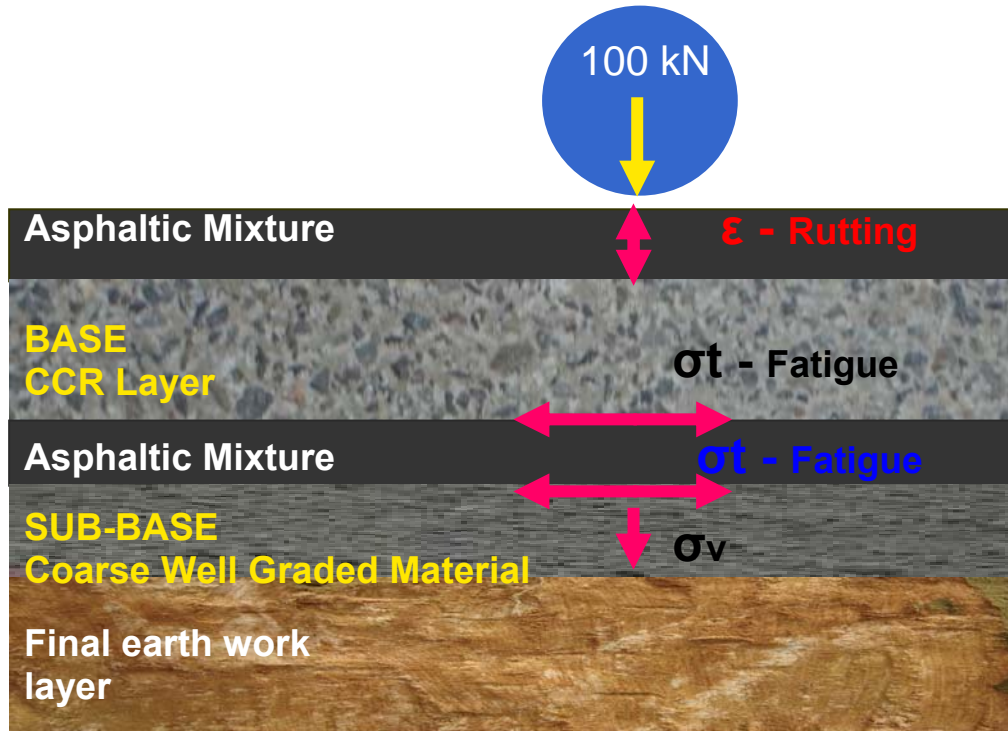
Composite pavement with CCR layer built above the asphaltic mixture.
